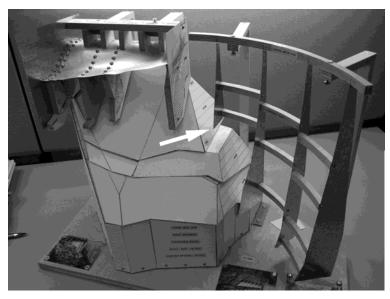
Nested foundation blocks, view from downstream (Reclamation)
